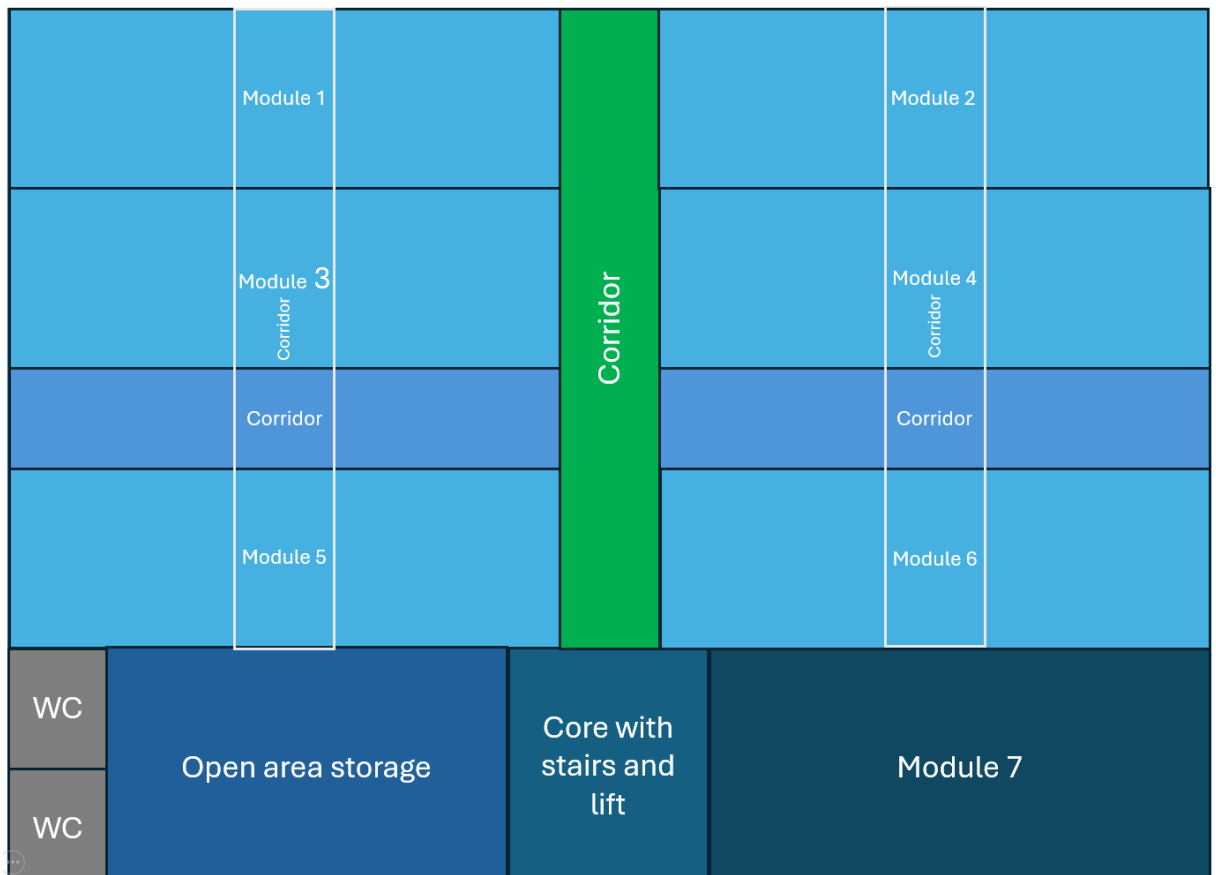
Modular layout of office building using a corridor type arrangement with stabilizing core. Length as dimension from left to right in image, width as dimension from bottom to top in image
